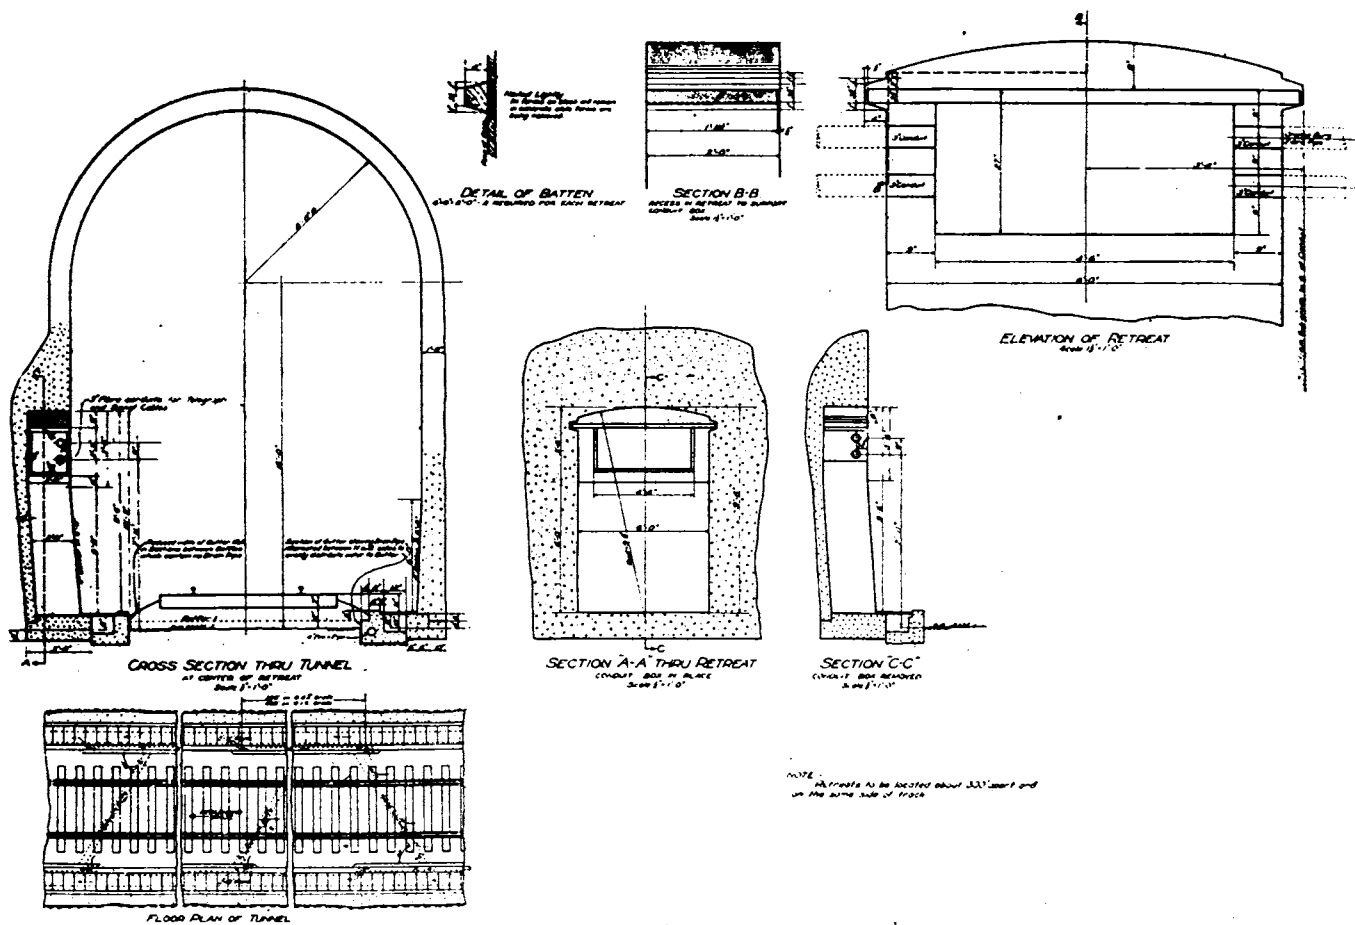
Cross Section and Retreat Details, Snoqualmie Tunnel, C. M. & St. P. Ry.
